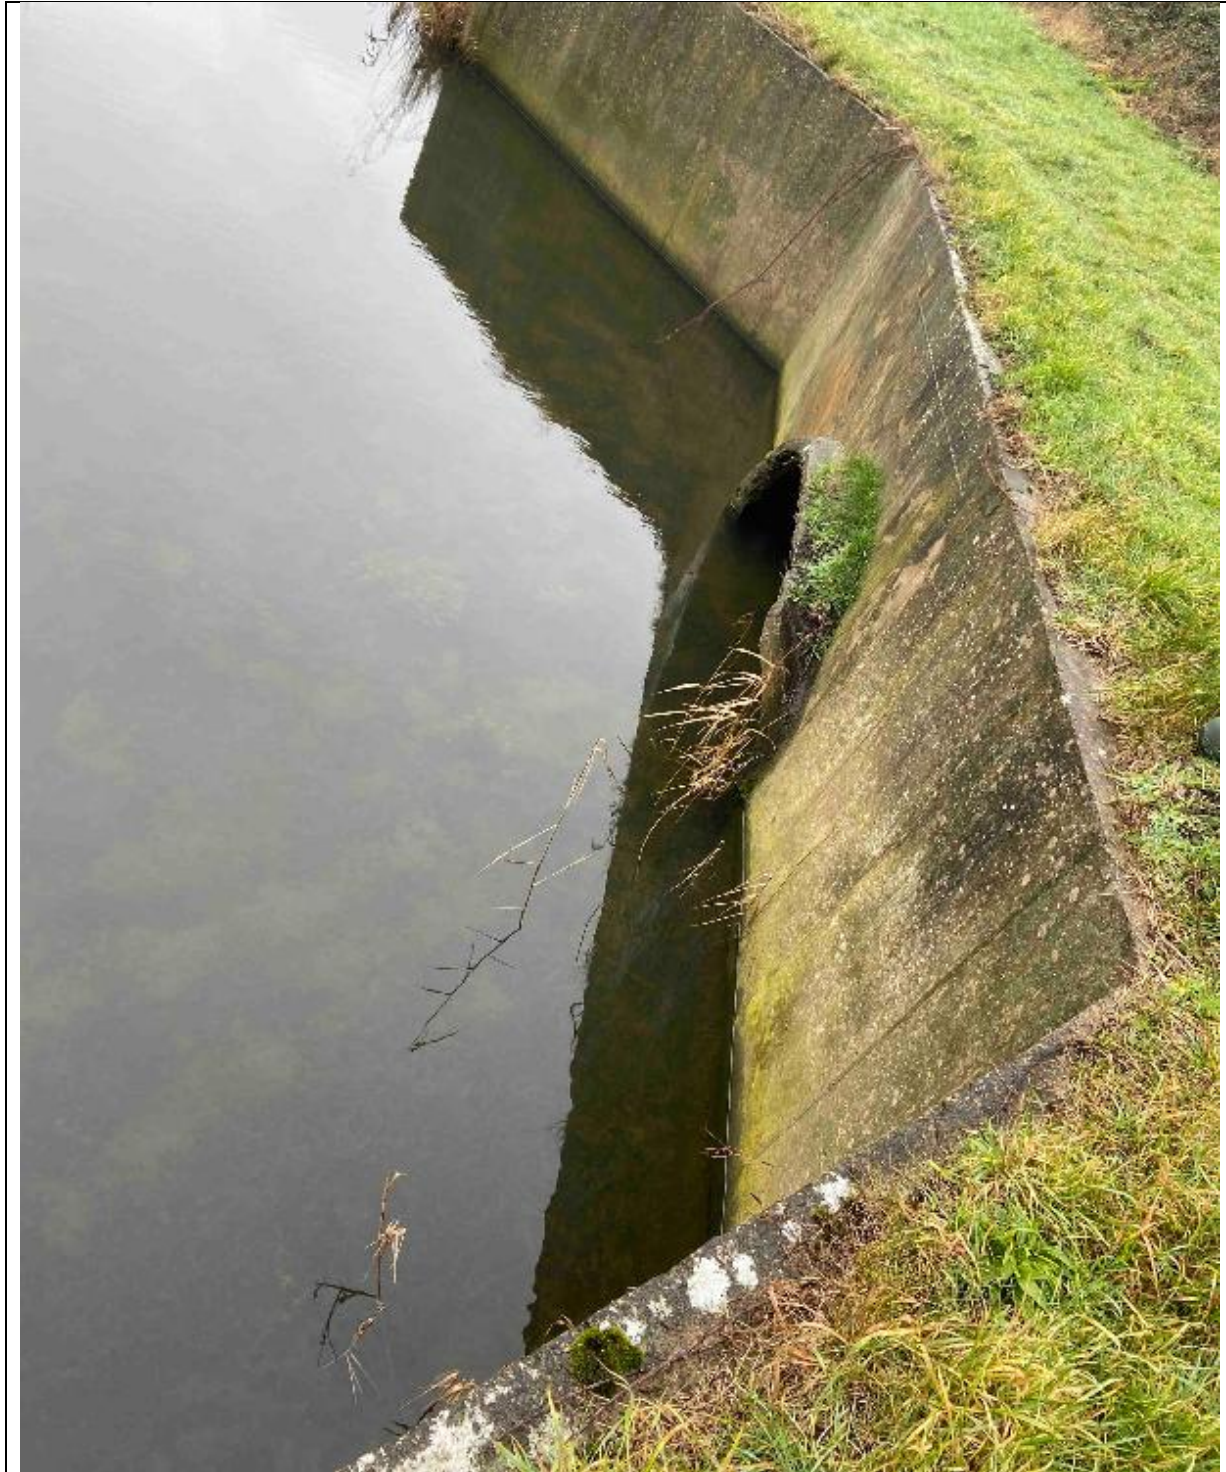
Location 10: View of the sluice gate from the banks of the lagoon. Photo taken facing East.
